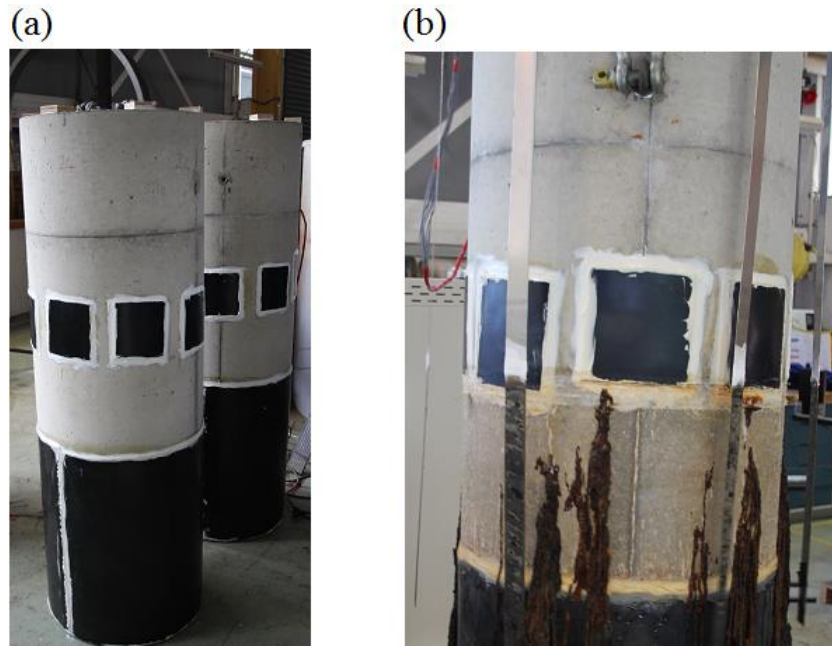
The RC columns: (a) prepared columns for corrosion; (b) corroded RC column
